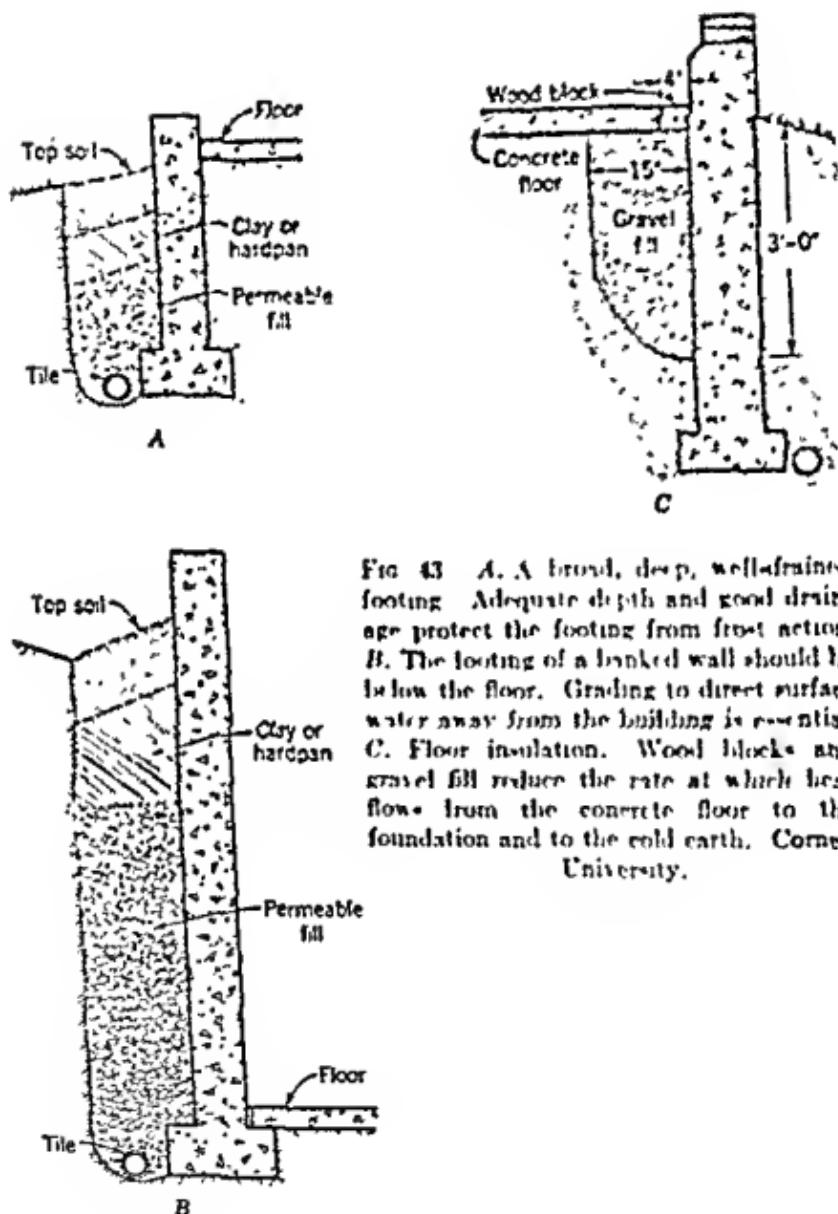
A. A broad, deep, well-drained footing. Adequate depth and good drainage protect the footing from frost action. B. The footing of a banked wall should be below the floor. Grading to direct surface water away from the building is essential. C. Floor insulation. Wood blocks and gravel fill reduce the rate at which heat flows from the concrete floor to the cold earth. Cornell University.
